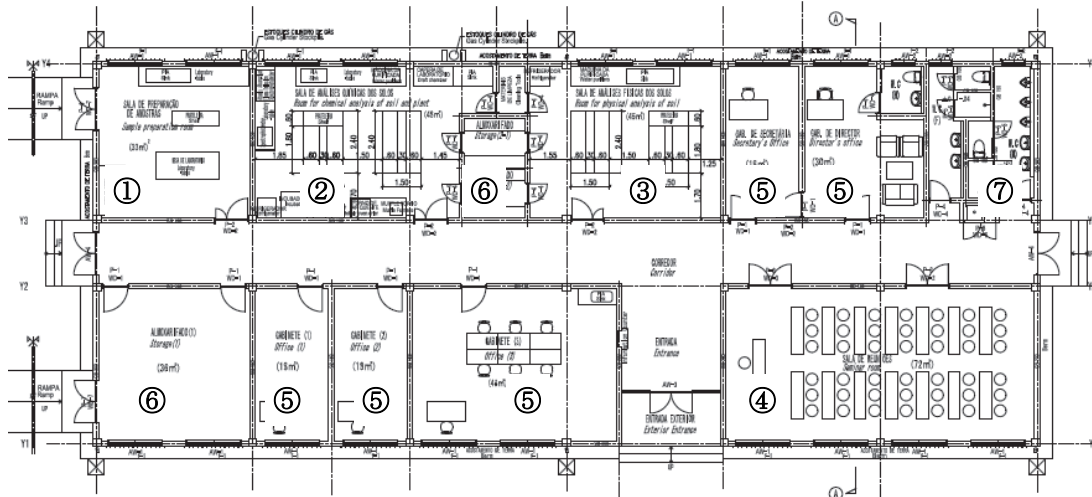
Plan of Soil and Plant Analysis Laboratory
